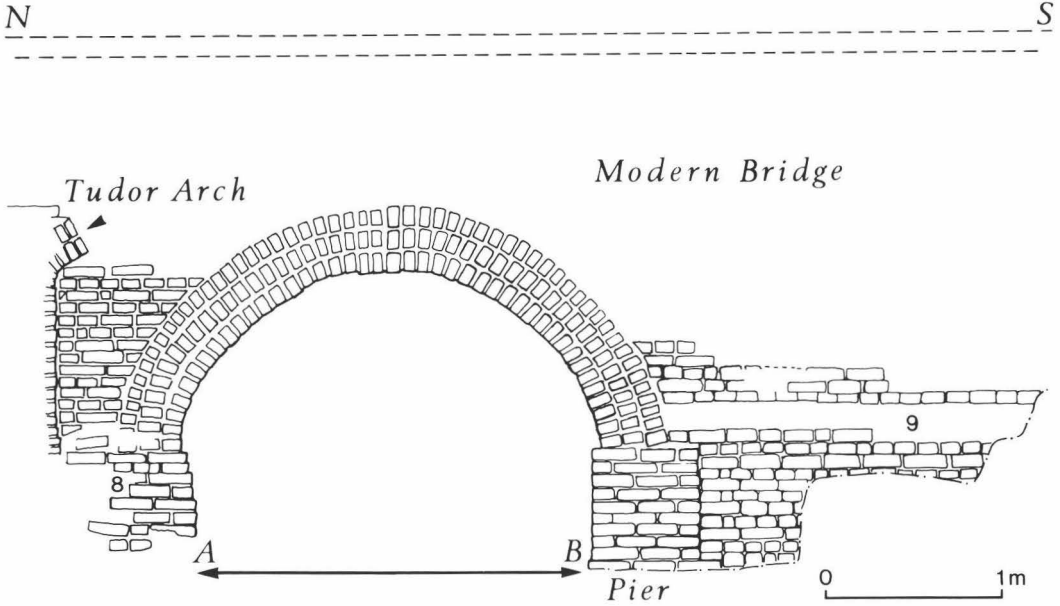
Laughton Place, 1984. Southern elevation of modern/Tudor brick bridge.
